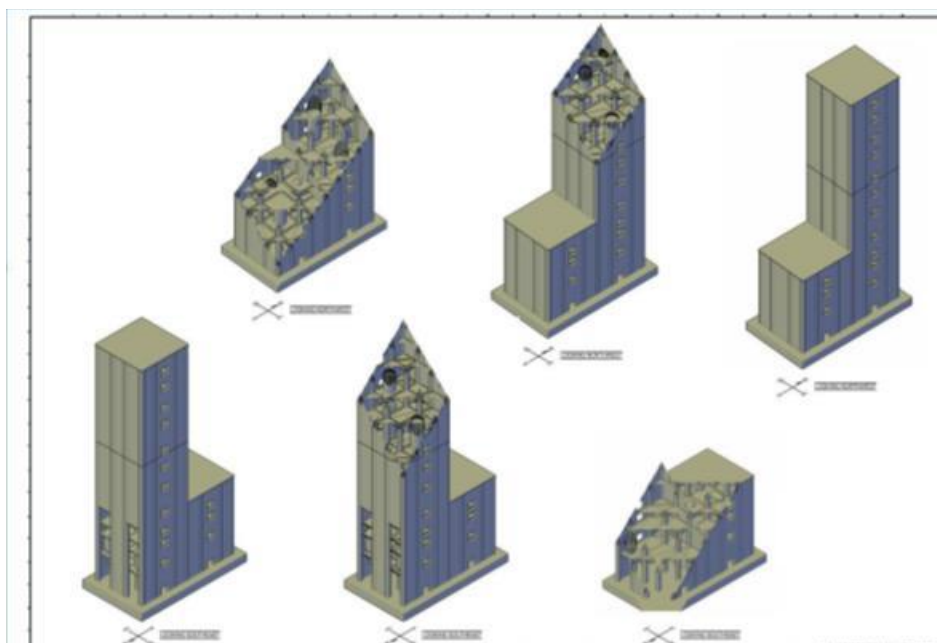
shows an isometric view of a stick built gasifier structure similar to the gasifier process structure at the Duke Edwardsport plant.
